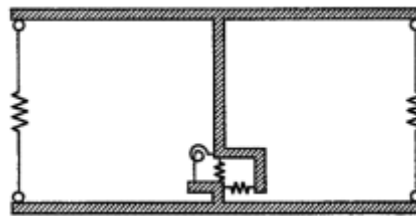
Macro element for single floor of wall pier proposed by Kabeyasawa et al. (1982)
